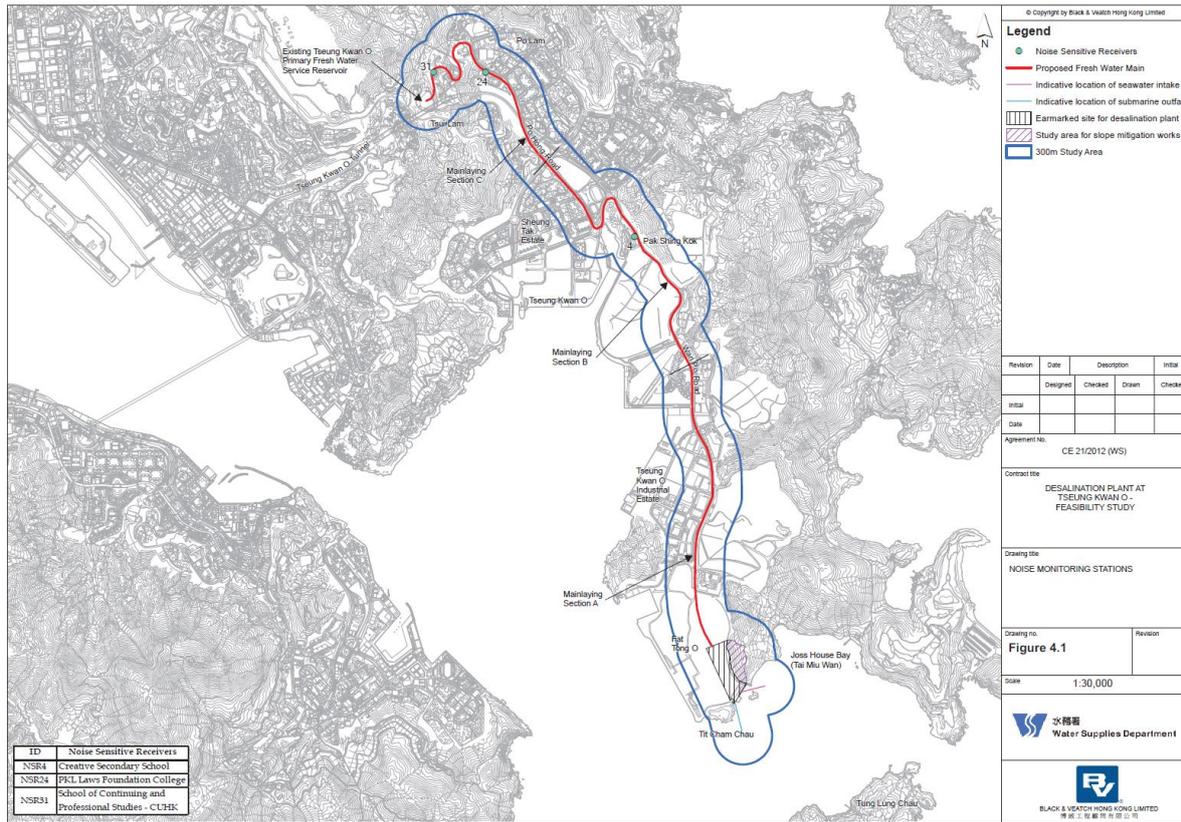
Site Layout Plan with Noise Sensitive Receivers and Desalination Plant
